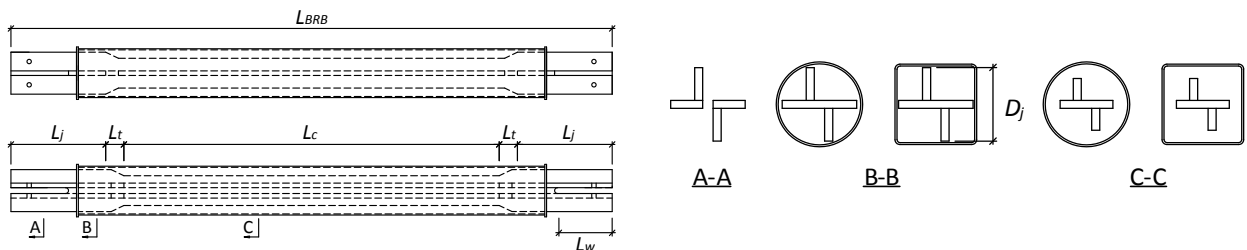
Profiles and cross sections of the WES-BRB component test specimen.
